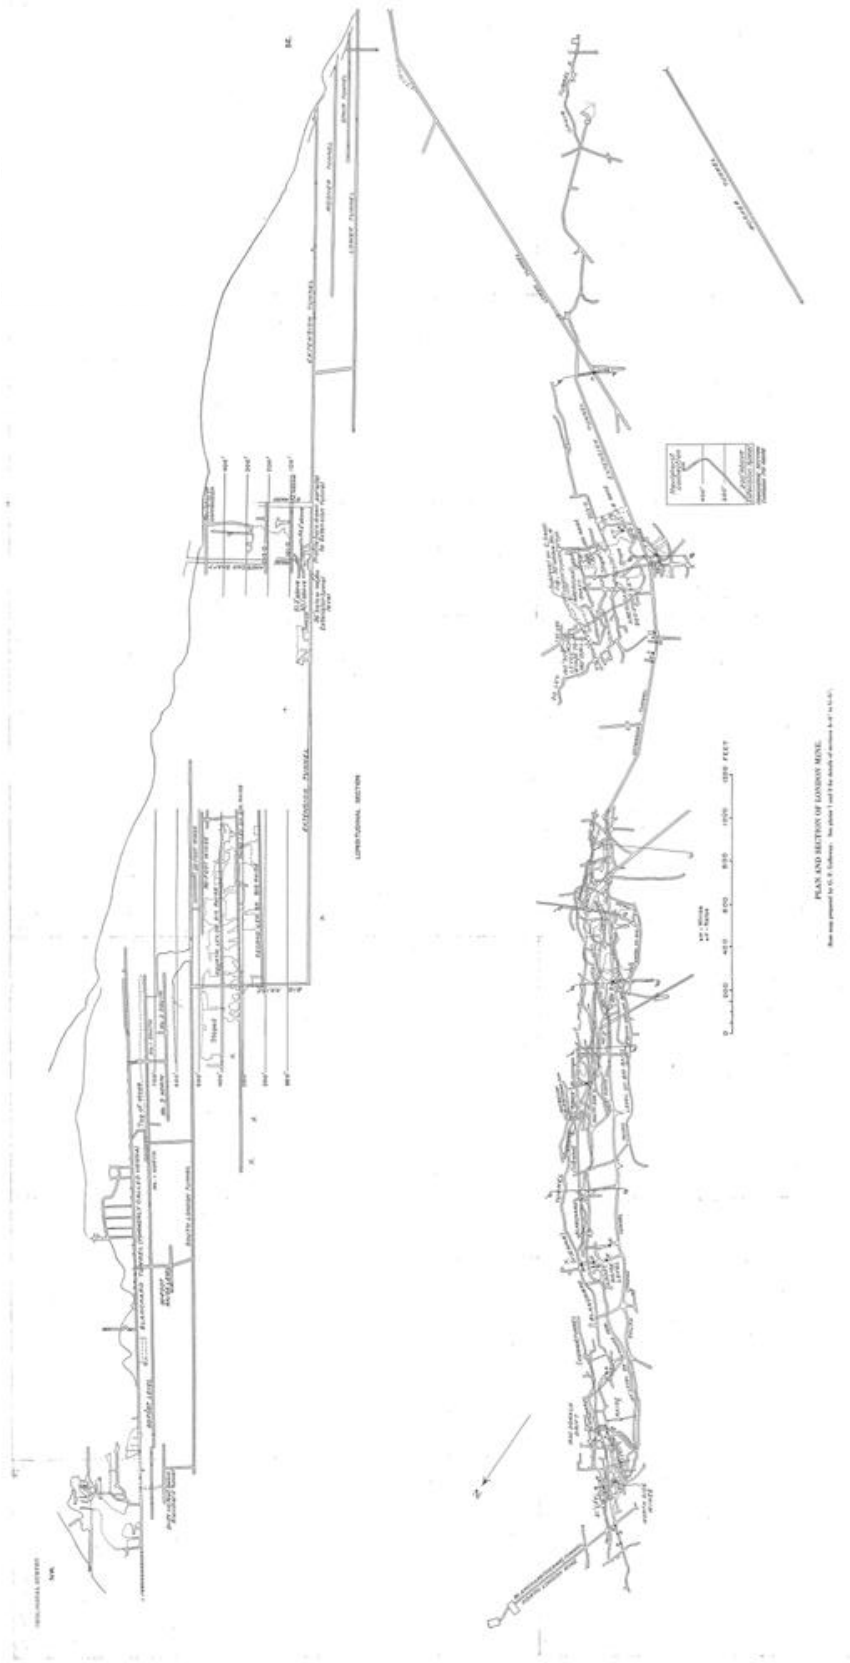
Plan and Longitudinal section through the London Mine, plate 6 after Singewald, 1941.
